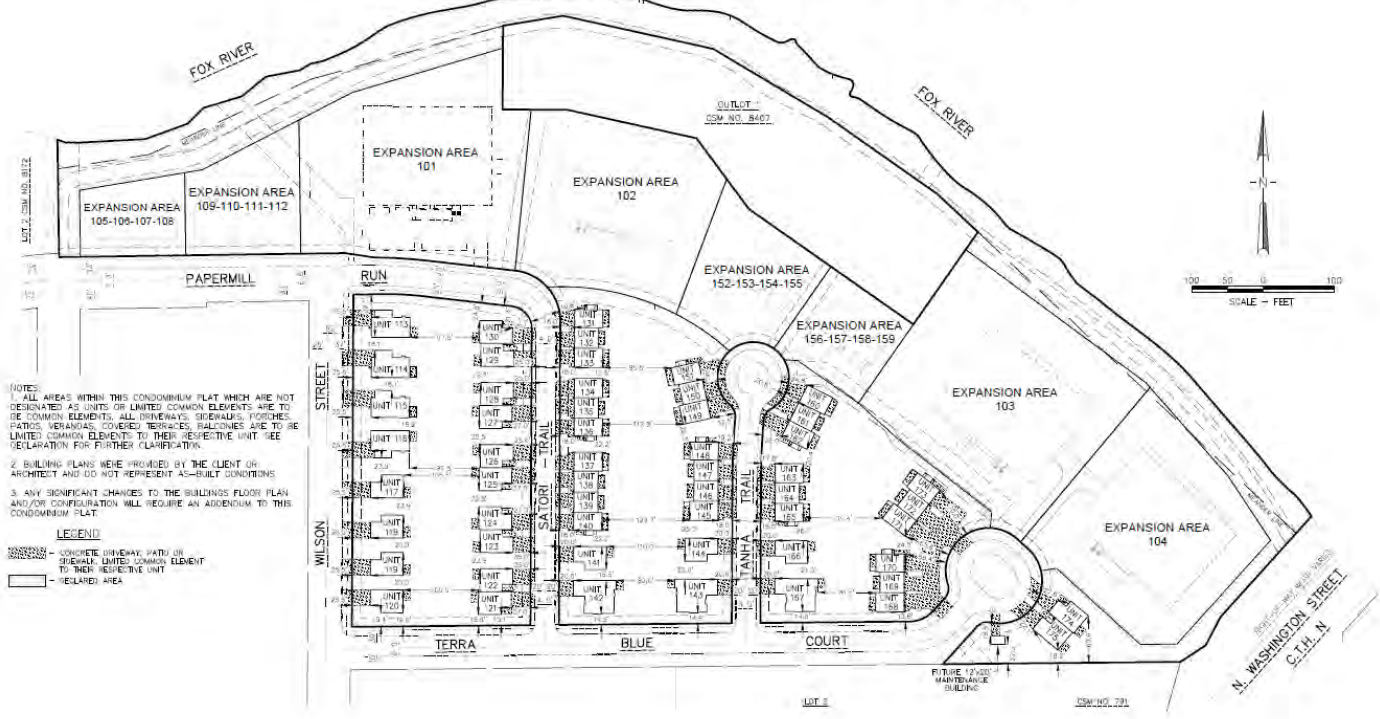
Exhibit C Sub-Associations 1, 5, 10 and 17 Architectural Building Plan Buildings
